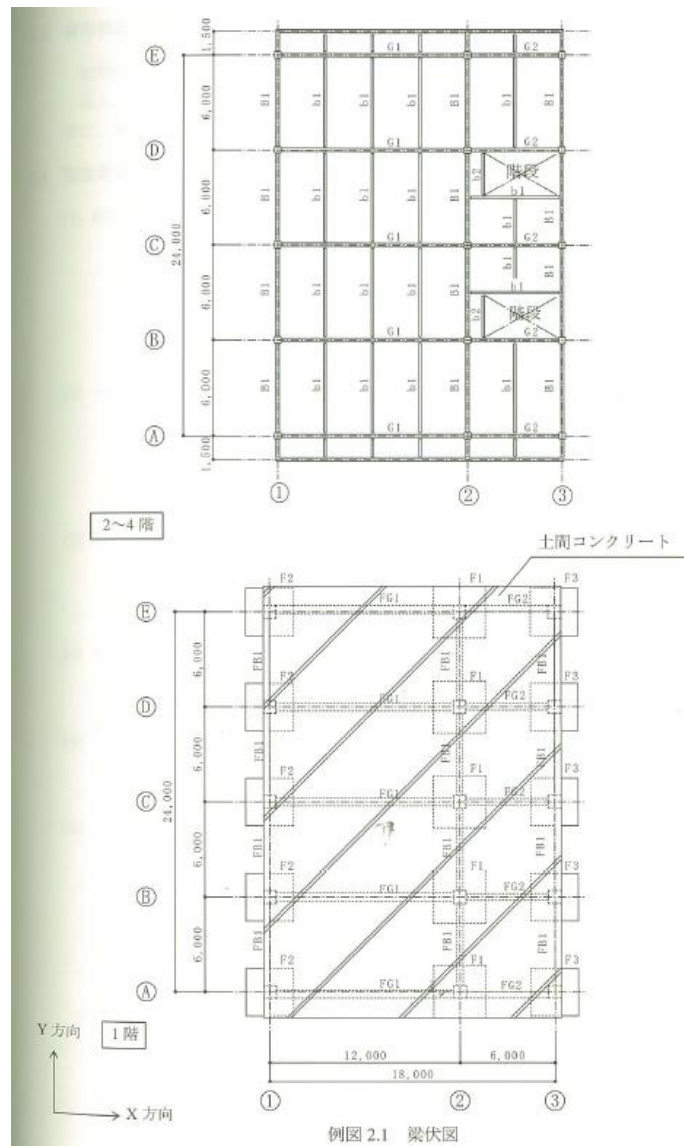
Typical Structural Plan for Office Buildings (Japan Building Disaster Prevention Association 2011)
